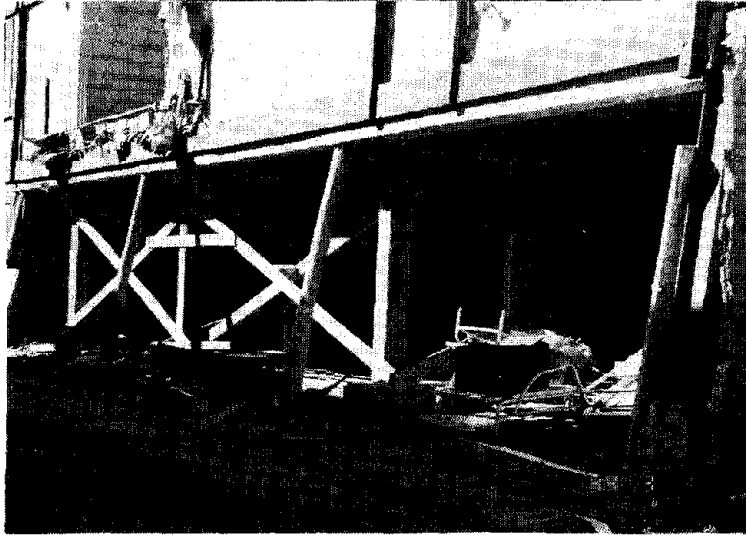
Damage of Northridge Meadows Apartment (First floor of the right side building was reinforced using wooden columns. Original posts were slender steel pipes)
